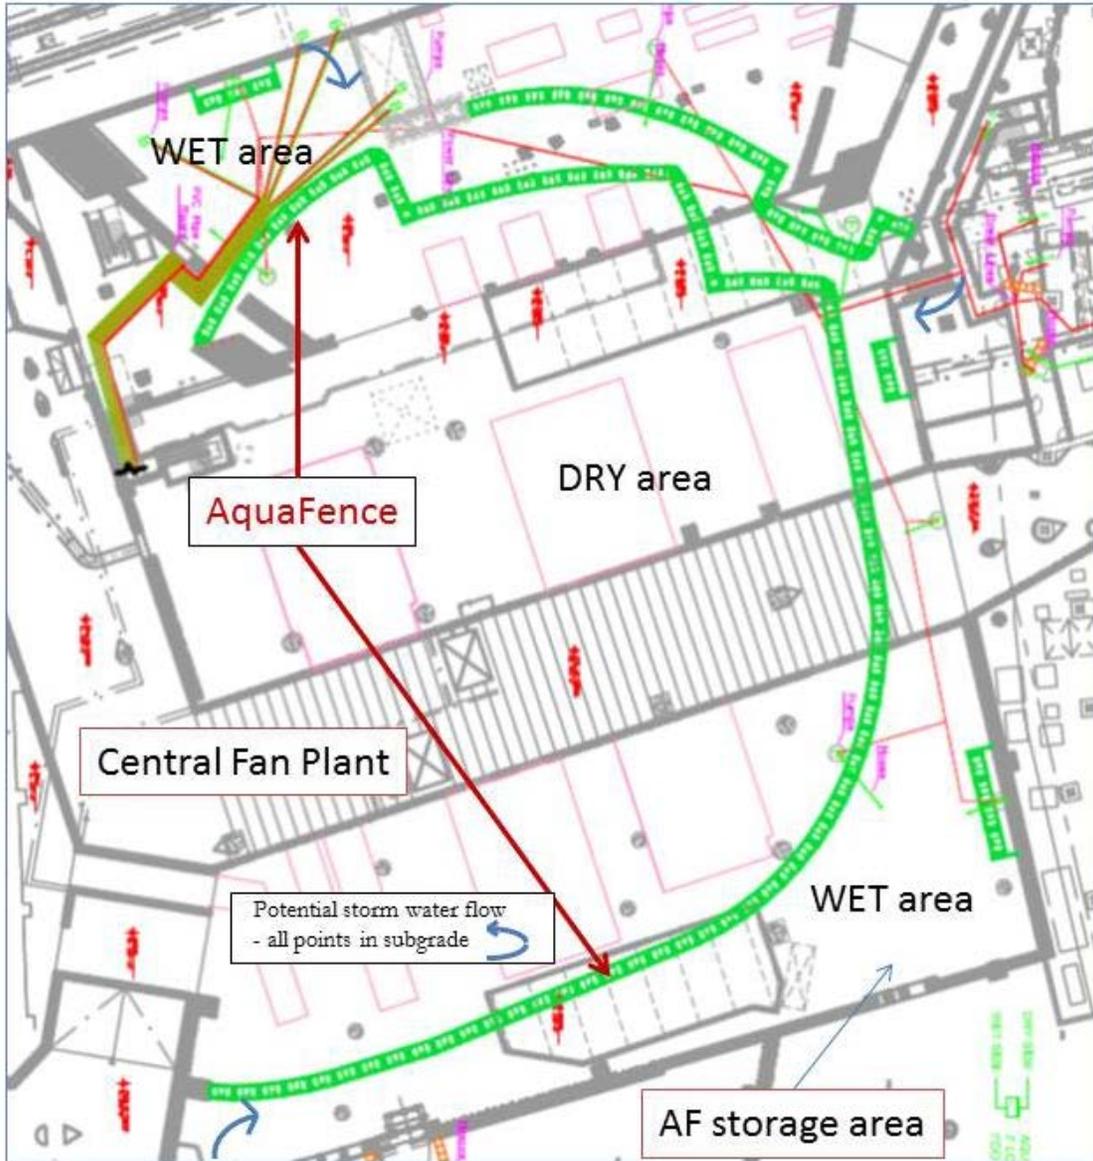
Subgrade Barrier Plan for South HUB / Central Fan Plant
